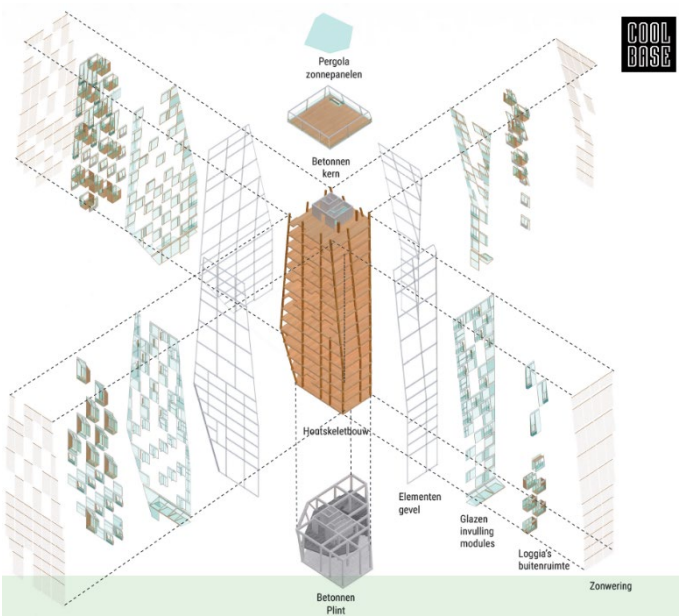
Explosion drawing of concrete core and timber frame construction (FSD, 2023)
